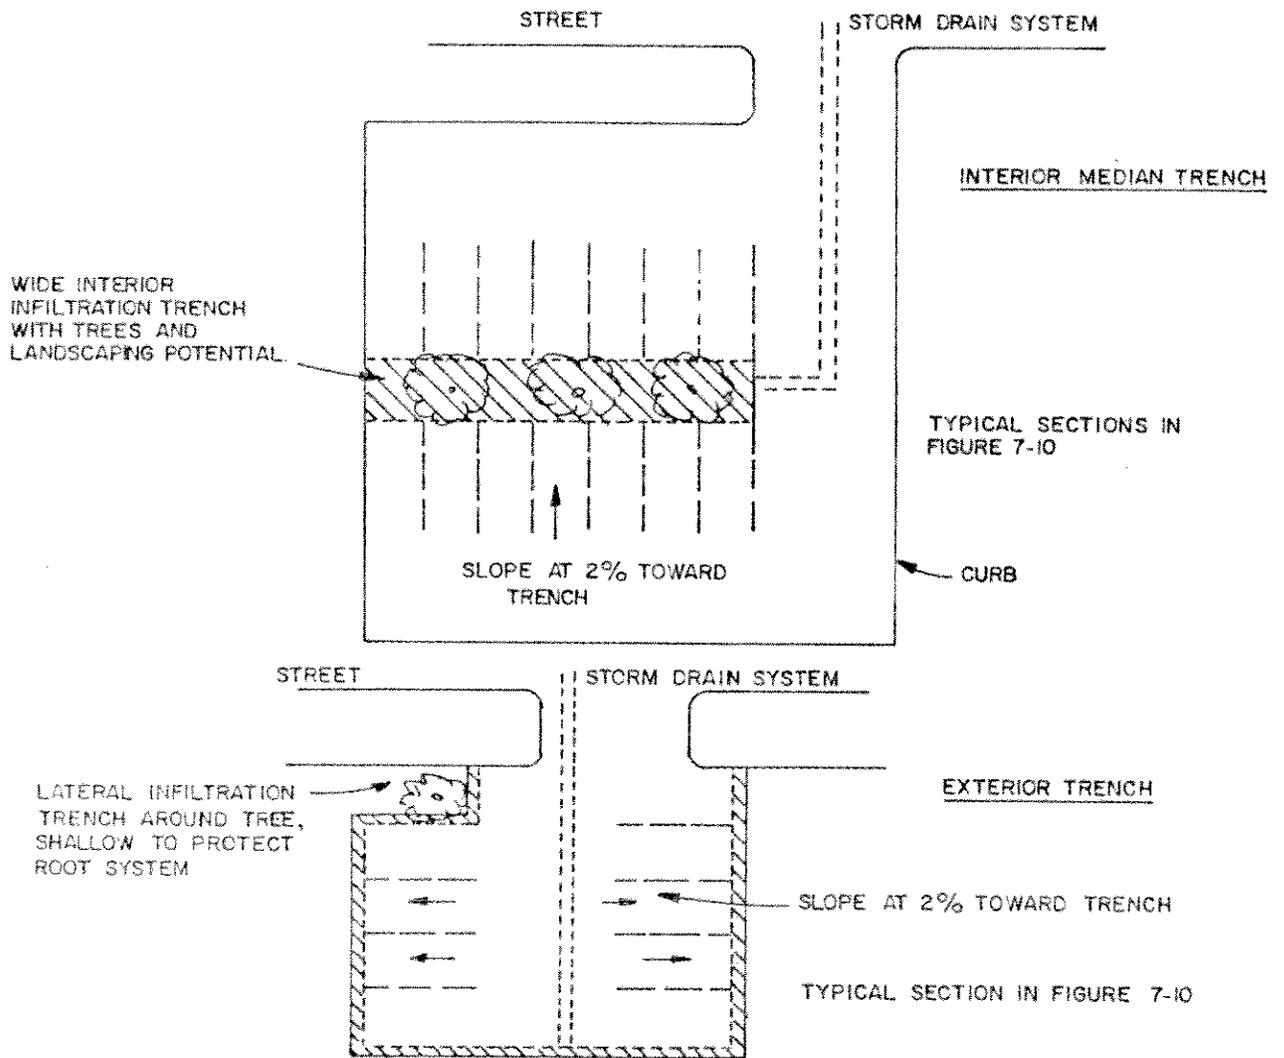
Examples of Parking Lot Infiltration Trenches
